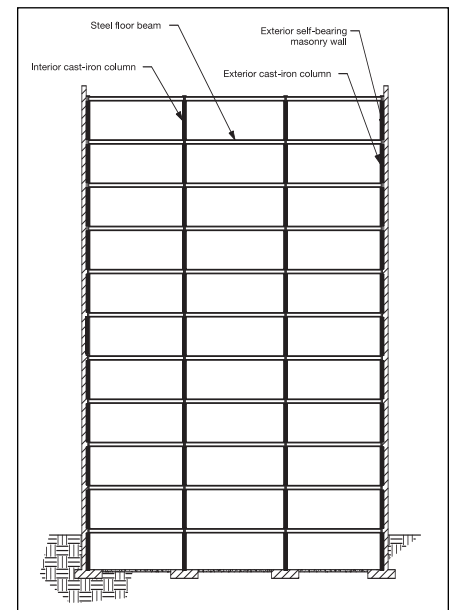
Schematic cross-section of wall-braced cage building. Note that the walls increase in thickness at a slower rate than in a bearing-wall building and also that the perimeter columns are embedded within the walls at the lower floors but not the upper floors. Drawing by the author.
